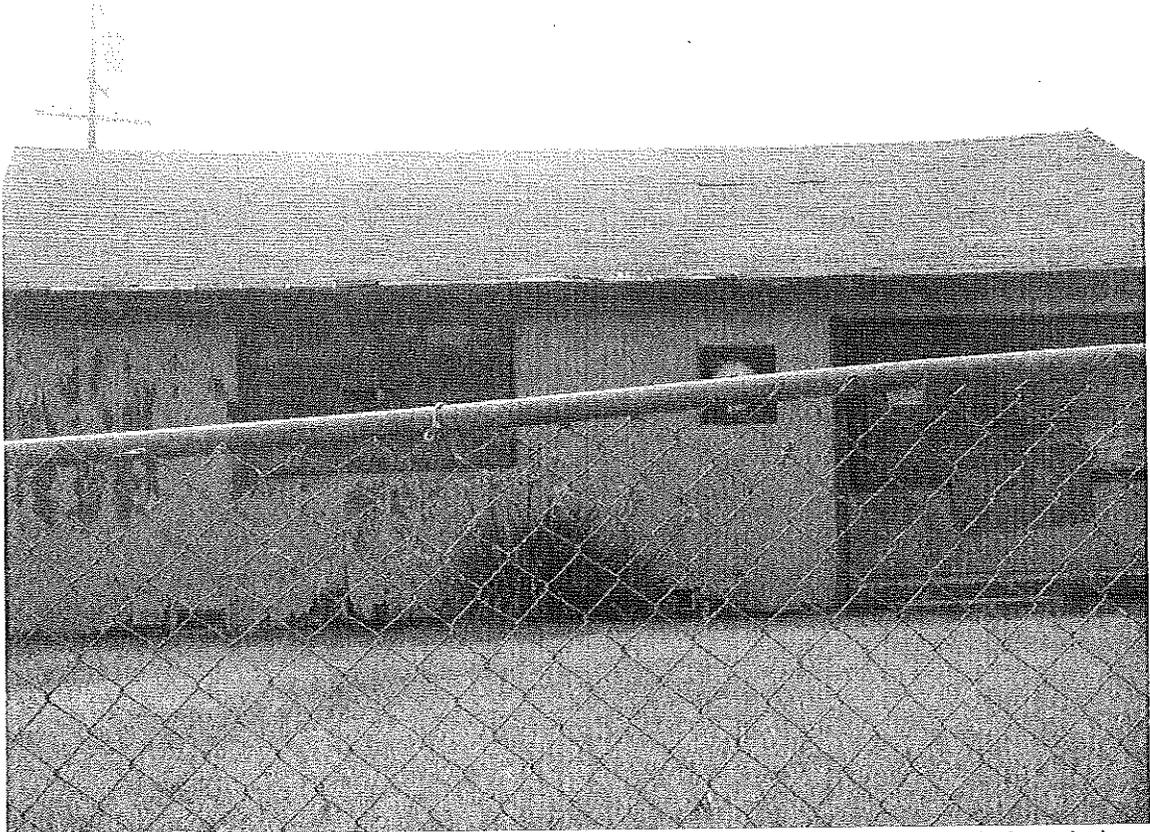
3900 Block of Palmetto Street, APN 251 0011 007: This property is boarded up and appears to be uninhabited. The exterior is damaged from faulty weather protection and the roof sags in the middle, causing damage to eaves. A sagging roof could be accompanied by a damaged support wall or beam and are a common code violation according to the City Code Enforcement Department
